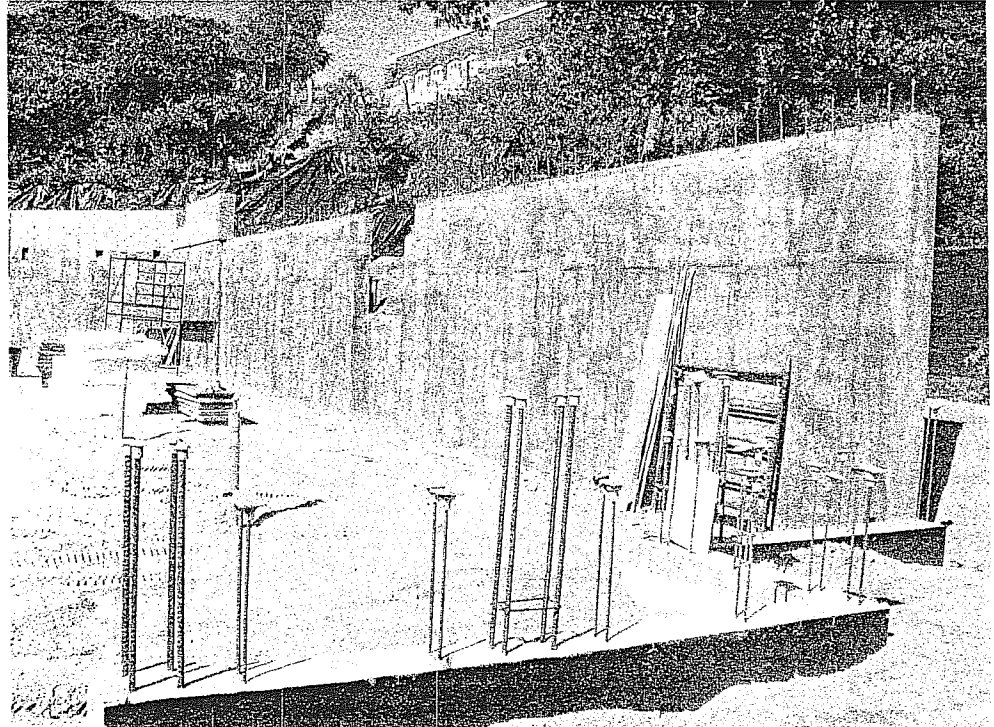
Reinforcement at Grid 8 for Masonry Piers
